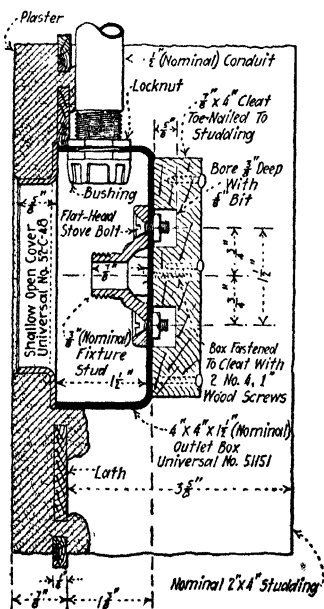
Showing method of fastening wall-bracket outlet box in a stud partition.
